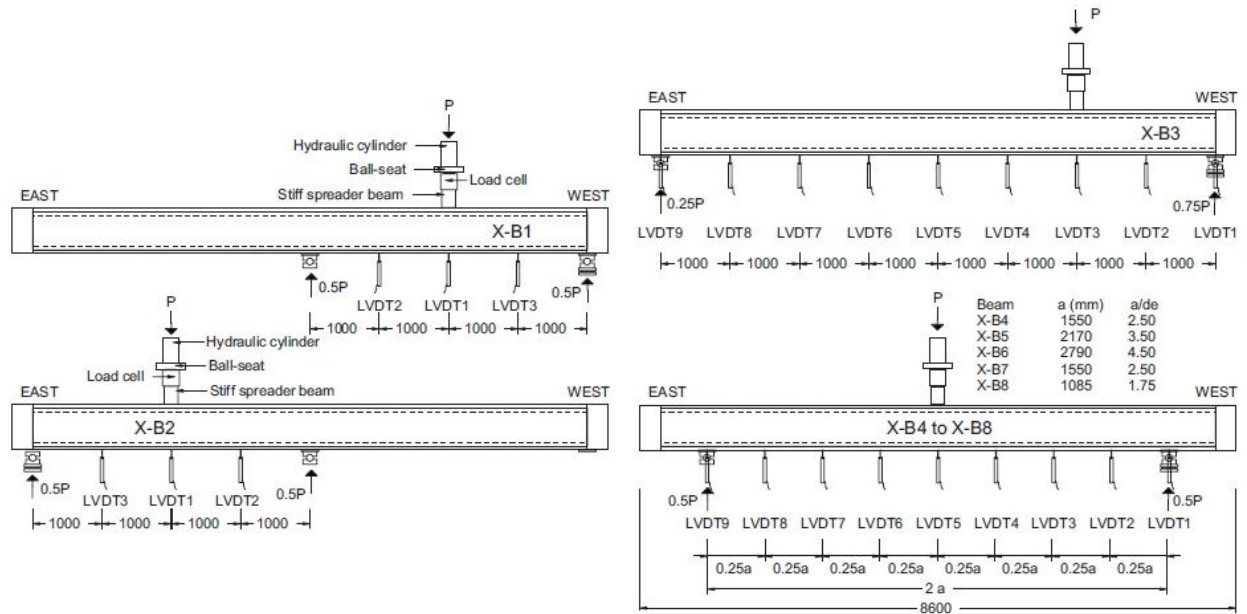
Loading conditions for beams tested by Voo et al. (2010).
